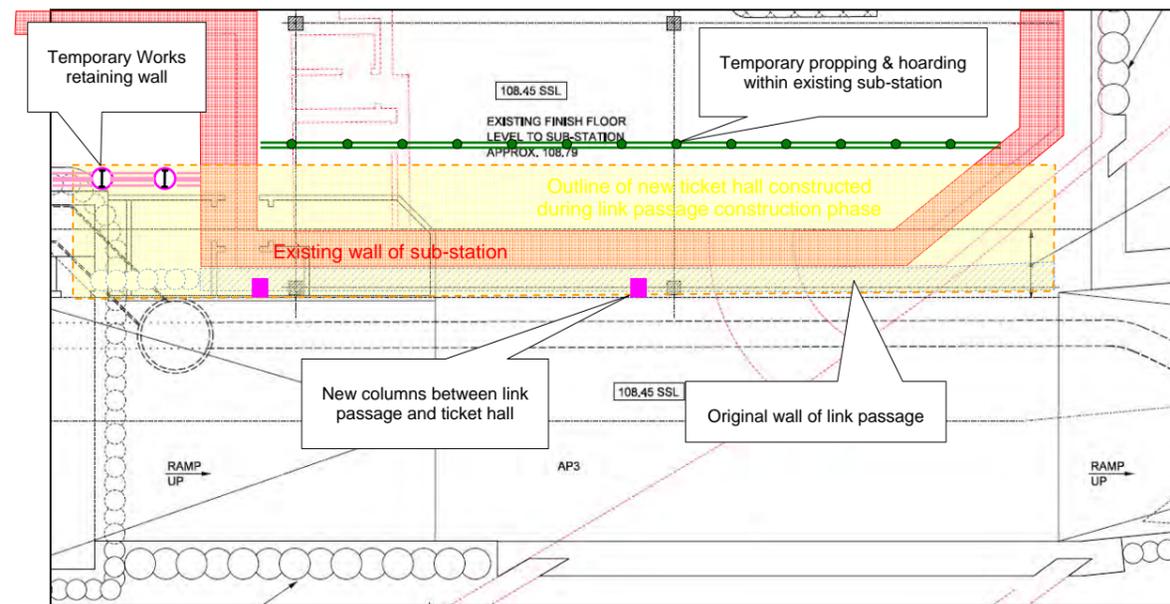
Interface between Link Passage and Broadgate Ticket Hall
